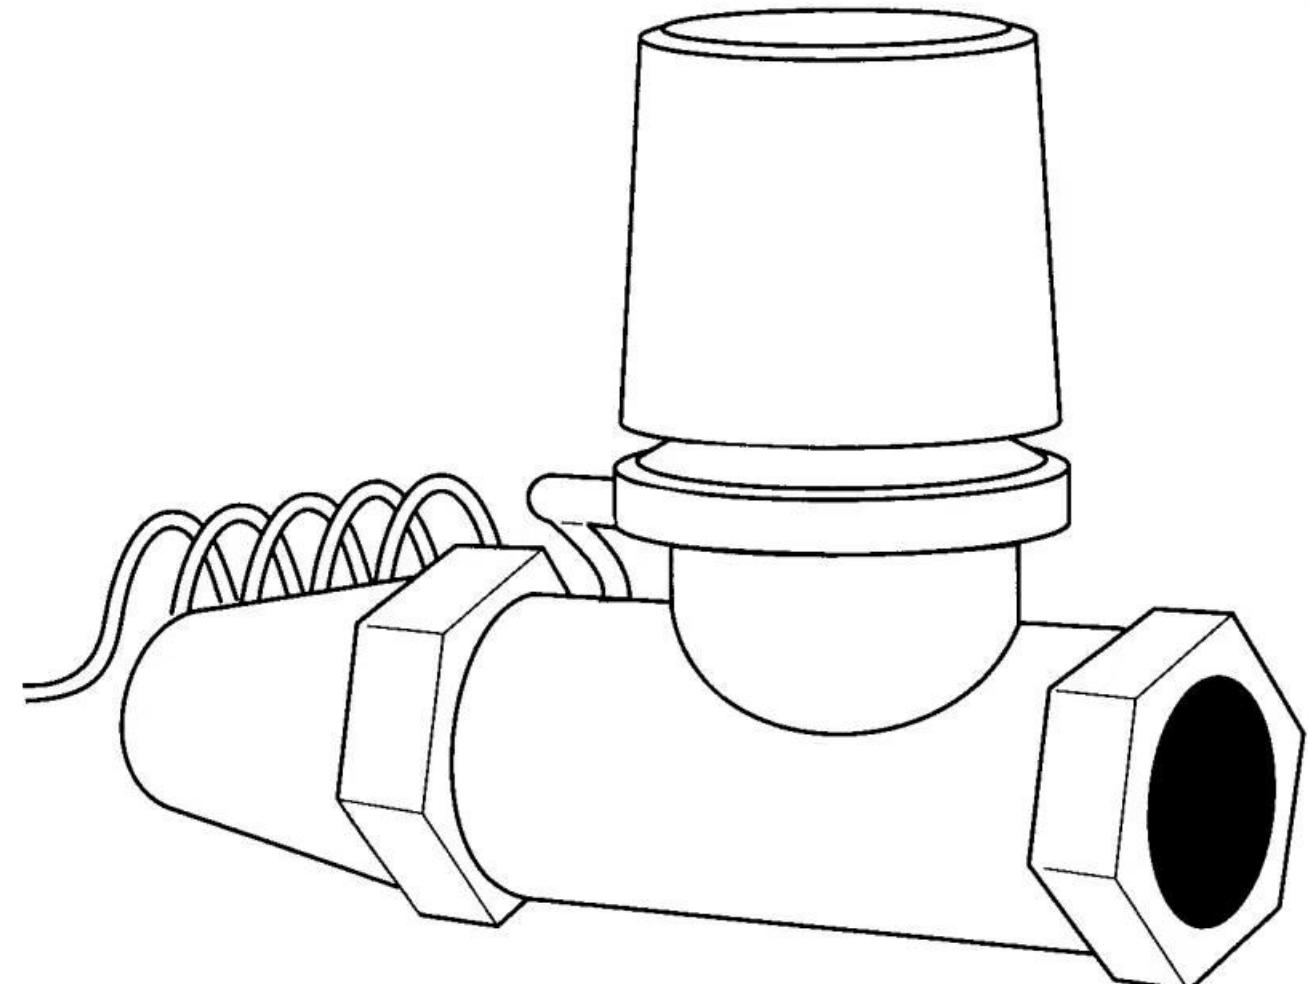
24 V actuator motor combined with a thermostatic radiator valve
